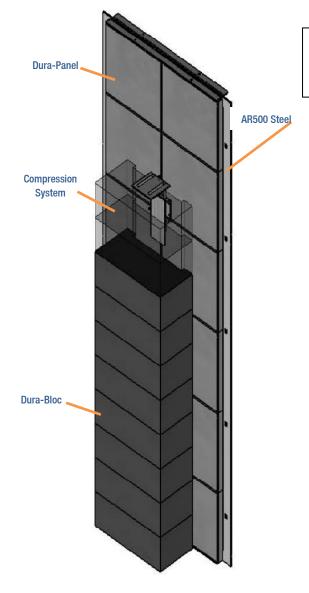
Figure A. Section view of Range Systems Encapsulator[™] Wall System. Constructed of AR500 steel, Dura-Panel[™] and Dura-Blocs[™] with proprietary compression system.
